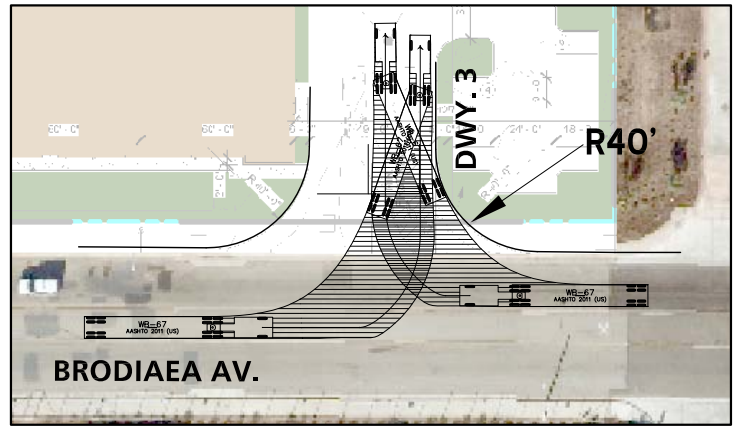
illustrates the proposed truck access for the site and circulation for Driveway 1 and Driveway 3. As shown on Exhibit 1-5, the proposed curb radii of 40-feet at the intersections of Frederick Street at Driveway 1 and Driveway 3 at Brodiaea Avenue are anticipated to accommodate the ingress and egress of trucks.
